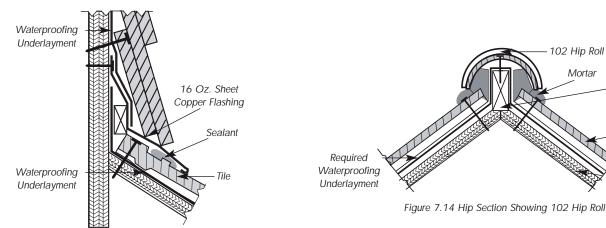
Section Showing Flashing Under ³/8" Flat Shingle Tiles
